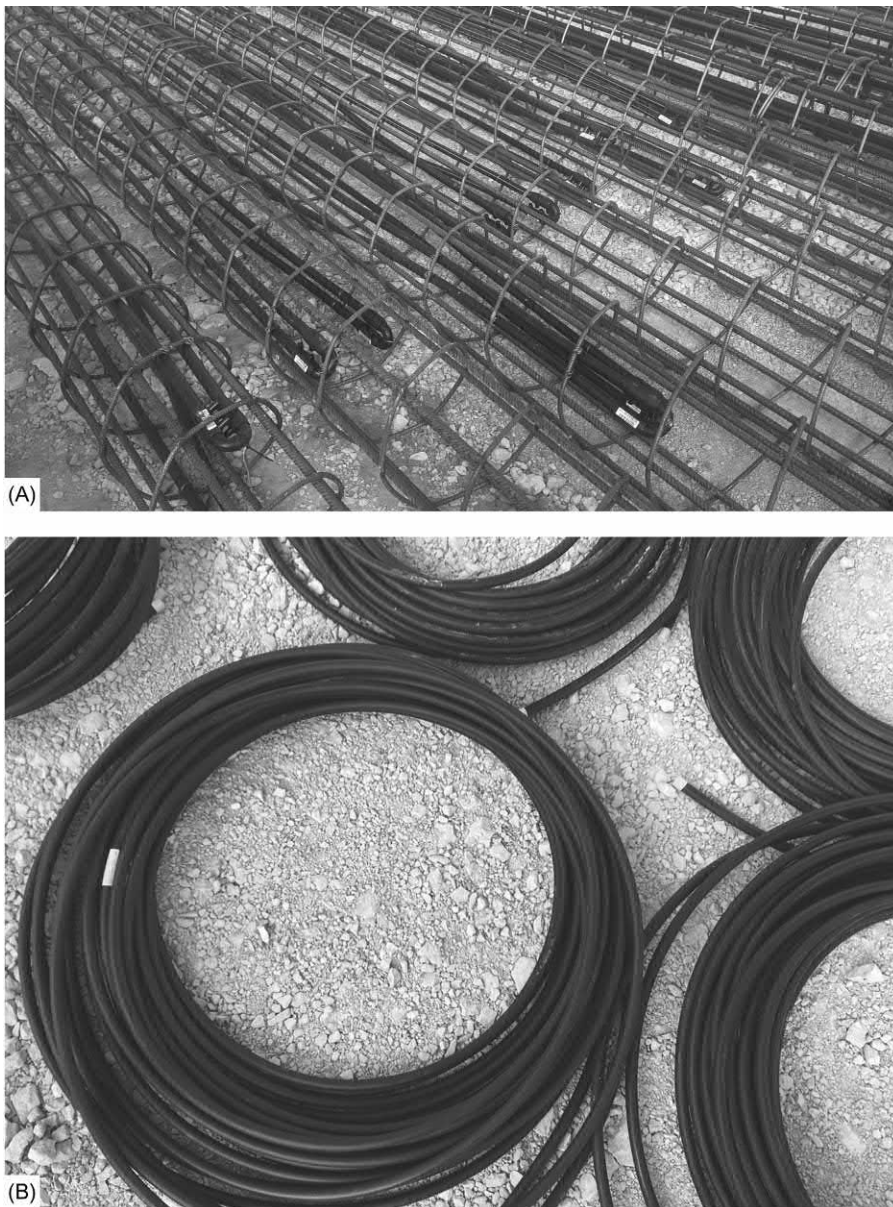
Typical pipes characterising energy geostructures: (A) example of connection between pipe edges in energy piles and (B) storage of pipes in a construction site.
